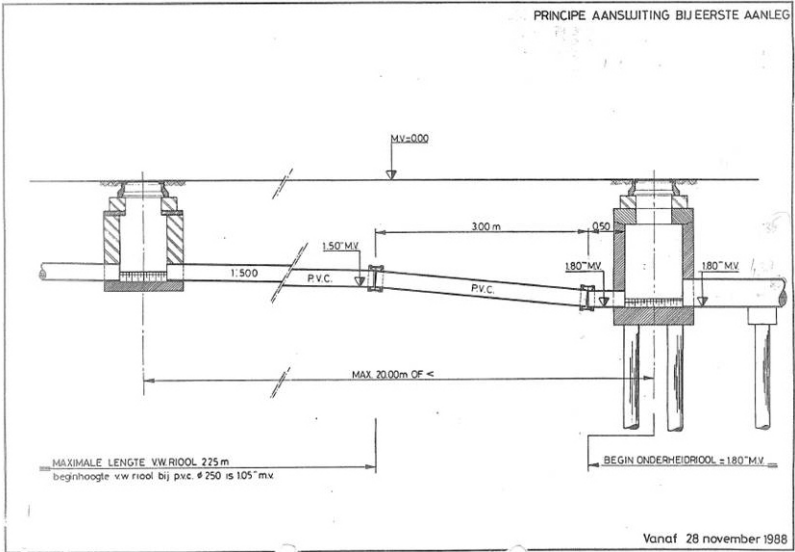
Design of the hinge sewer, a sewer with a shallow foundation connected to a manhole with a deep foundation.
